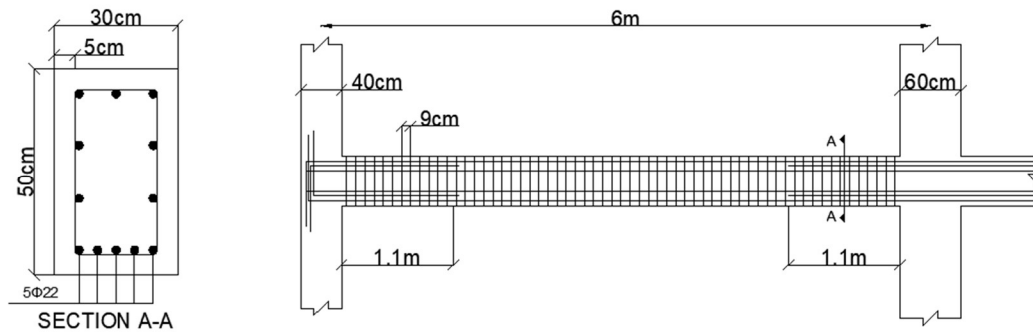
The section and reinforcement detailing of Type 1 beam in the design
